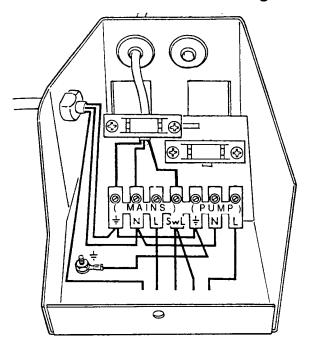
WIRING THE BOILER FOR COMBINED GRAVITY HOTWATER/PUMPED CENTRAL HEATING SYSTEM
